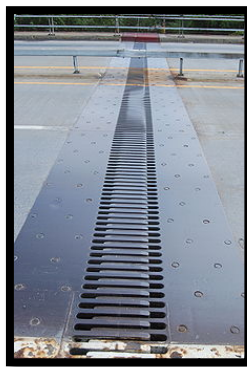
EXPANSION JOINT ON A BRIDGE (WIKIMEDIA FOUNDATION, 2012)
